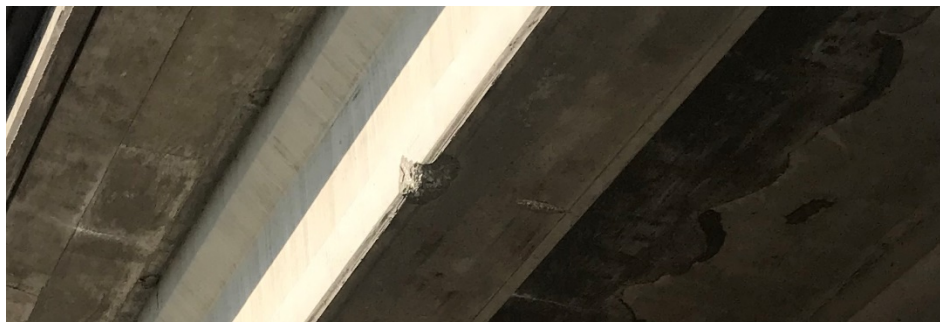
Impact damage at the replaced girder, York East Bridge, courtesy of NDOT
